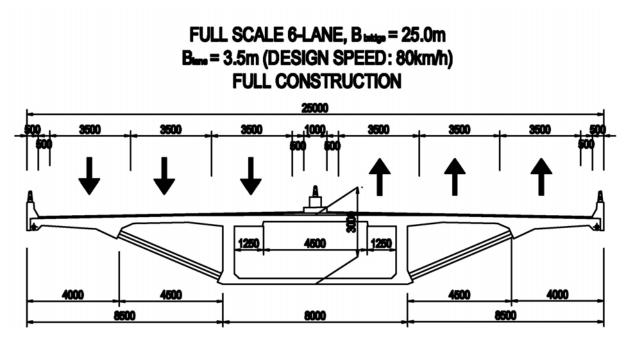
Typical Cross Sections of Alternative (3), Case 6-3.5
